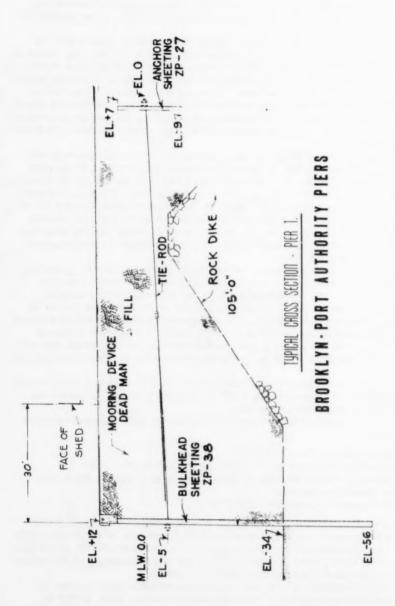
Brooklyn - P. A. Piers - Pier 1 - Bulkhead Area - Typical Cross Section
